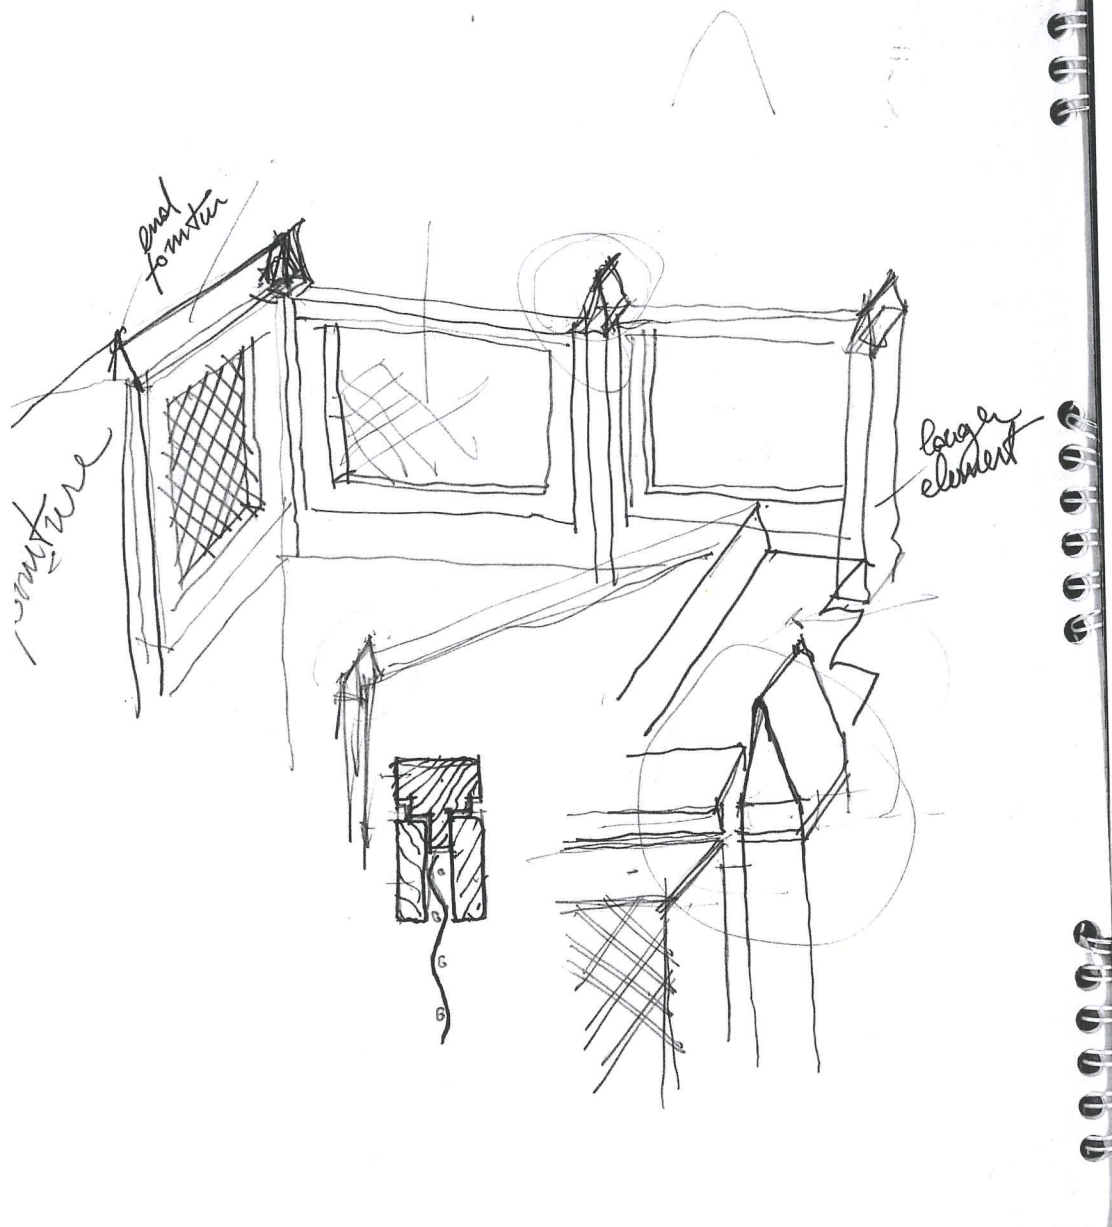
Master's Apartment in the House of 1925, Initial Sketches of Skylight, Stair and Handrail Details
